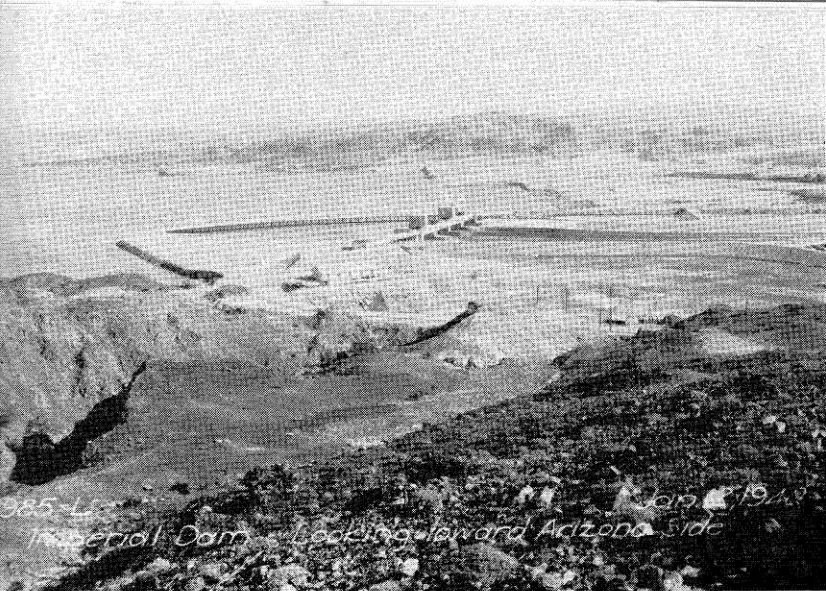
Imperial Dam, looking toward the Arizona side. Rockwood Heading is to the far right.
